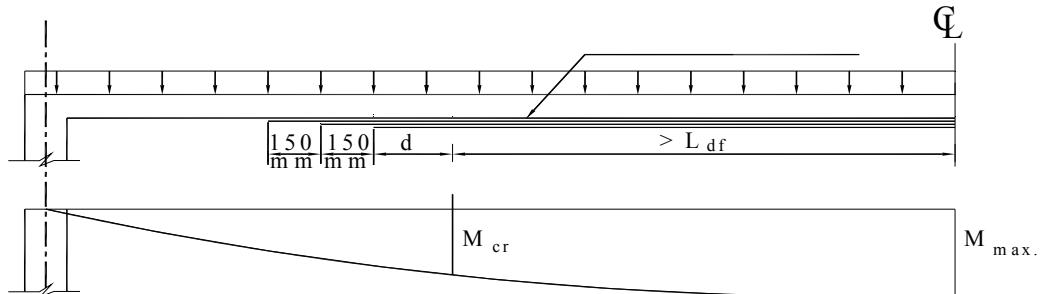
a Termination of FRP laminates for simply supported beams
